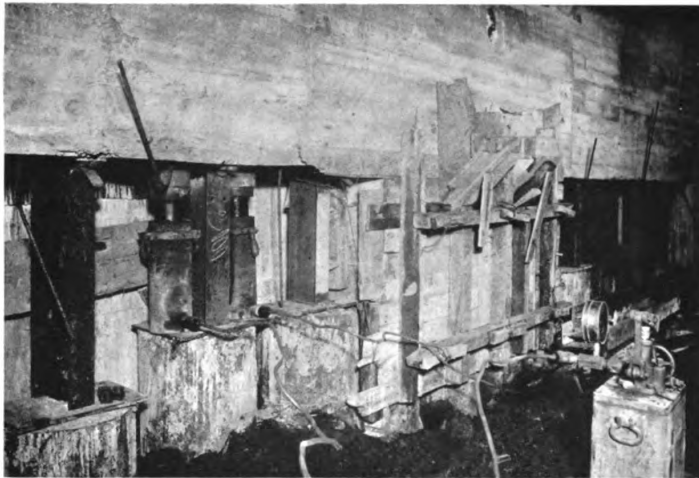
View of Foundation Showing Hydraulic Jacks Used to Force Piles Down as Building Progressed
